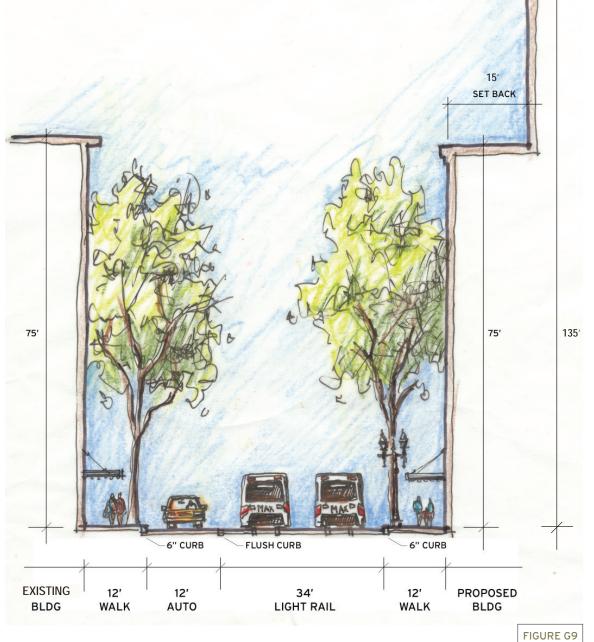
West wall of Block 34 FIGURE G7: Distinctive pedestrian/light rail paving FIGURE G8: Historic facades, covered by trees FIGURE G9: Section (First Avenue, north of Couch) showing proposed building height.
